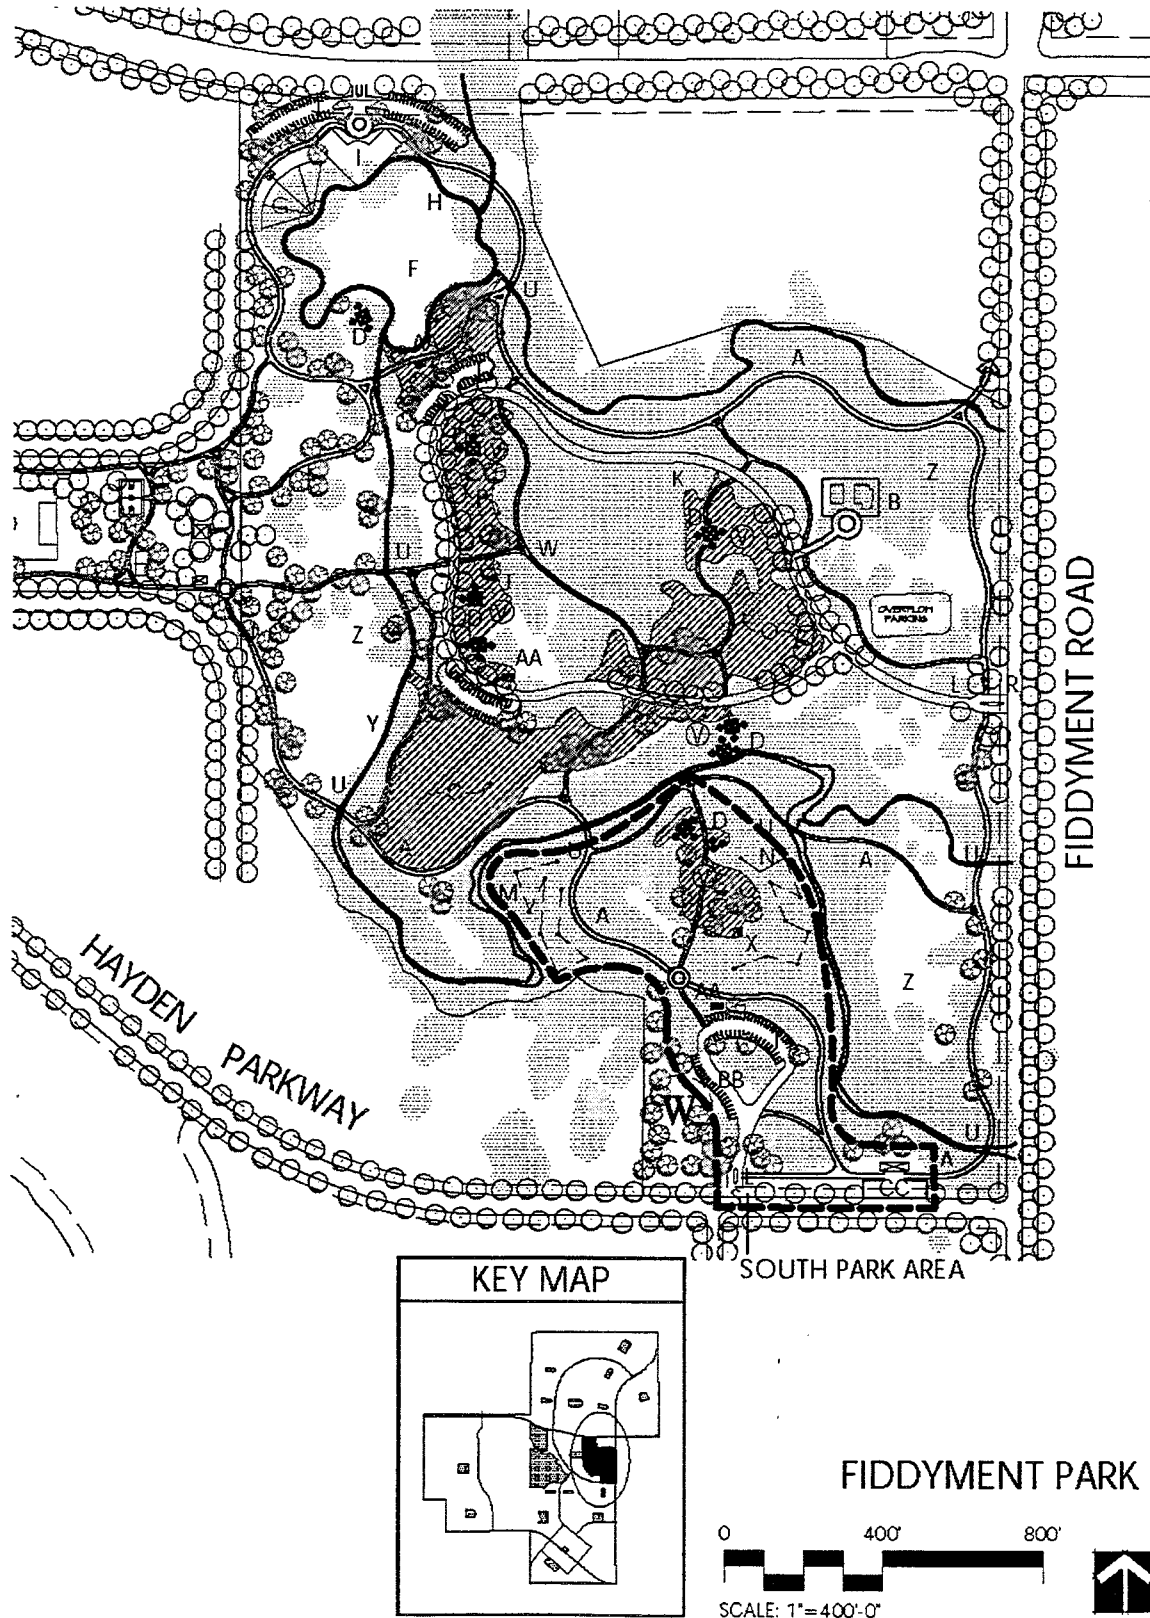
Fiddymment Park Conceptual Plan Legend
